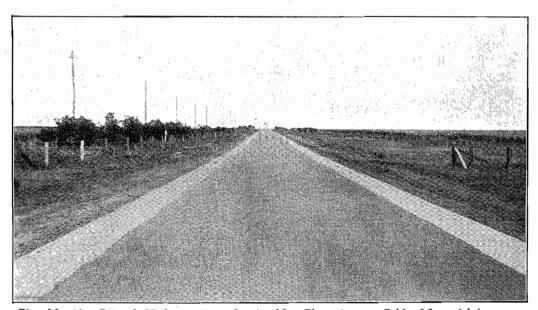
Prince's Highway West, showing New Plantations on Calder Memorial Avenue.
